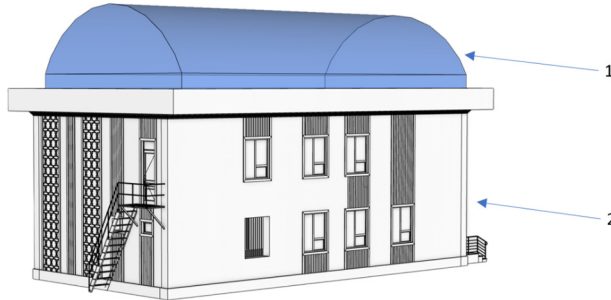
General scheme of arrangement of the greenhouse located on the roof of the building: 1 – rooftop greenhouse; 2 – building
